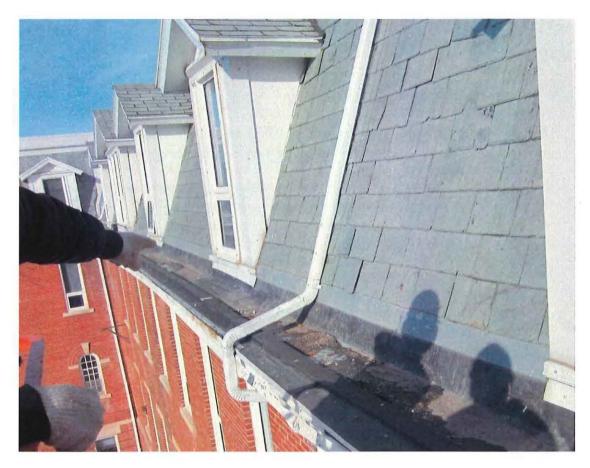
South façade – plugged off roof drain location (below downspout). Also note broken, loose slates with face fastening.
